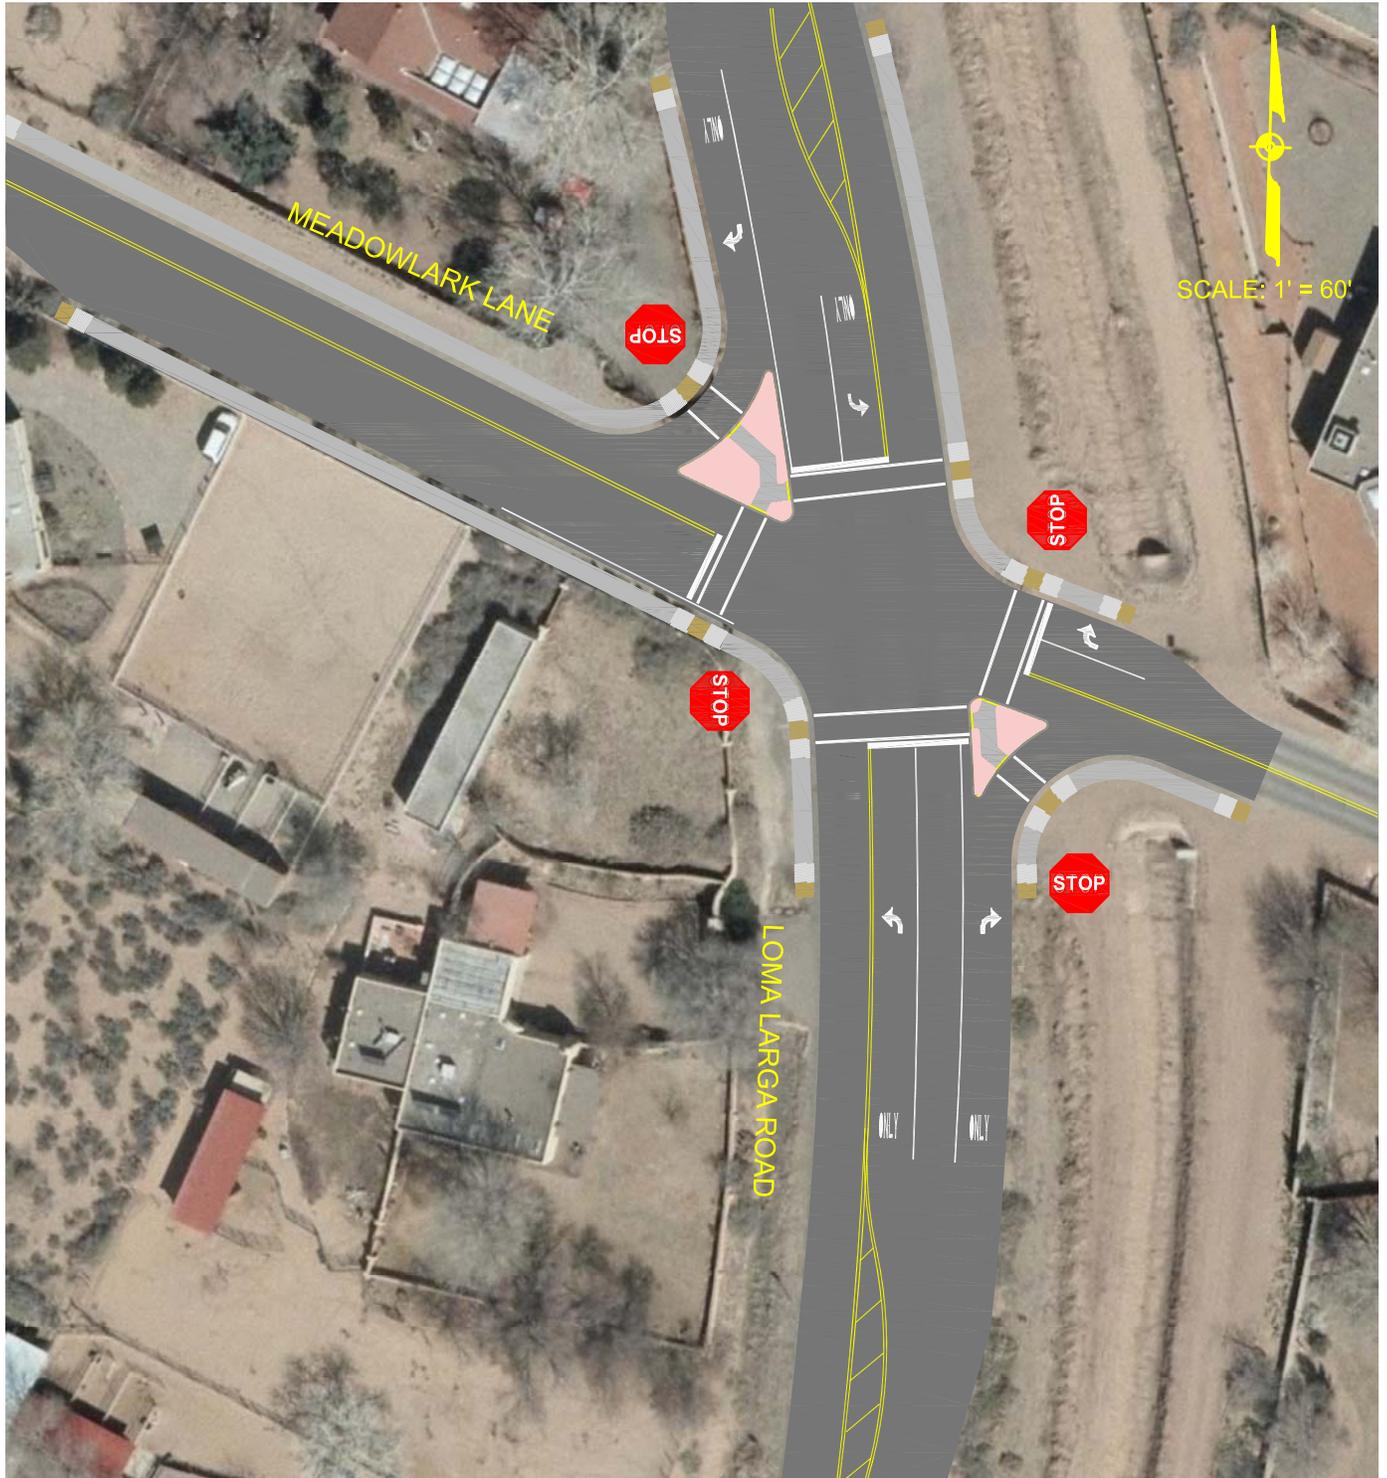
INSTALLATION OF ALL WAY STOP, RE-ALIGNMENT AND RE-STRIPING OF EXISTING INTERSECTION
